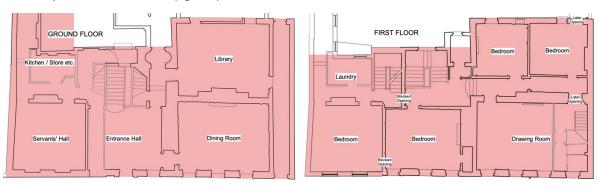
Current ground & first floor plans of nos. 29-31 with 1835 footprint (red), and original room labels added based on dimensions. Later walls within the 1835 plan are shown as grey dotted lines.
